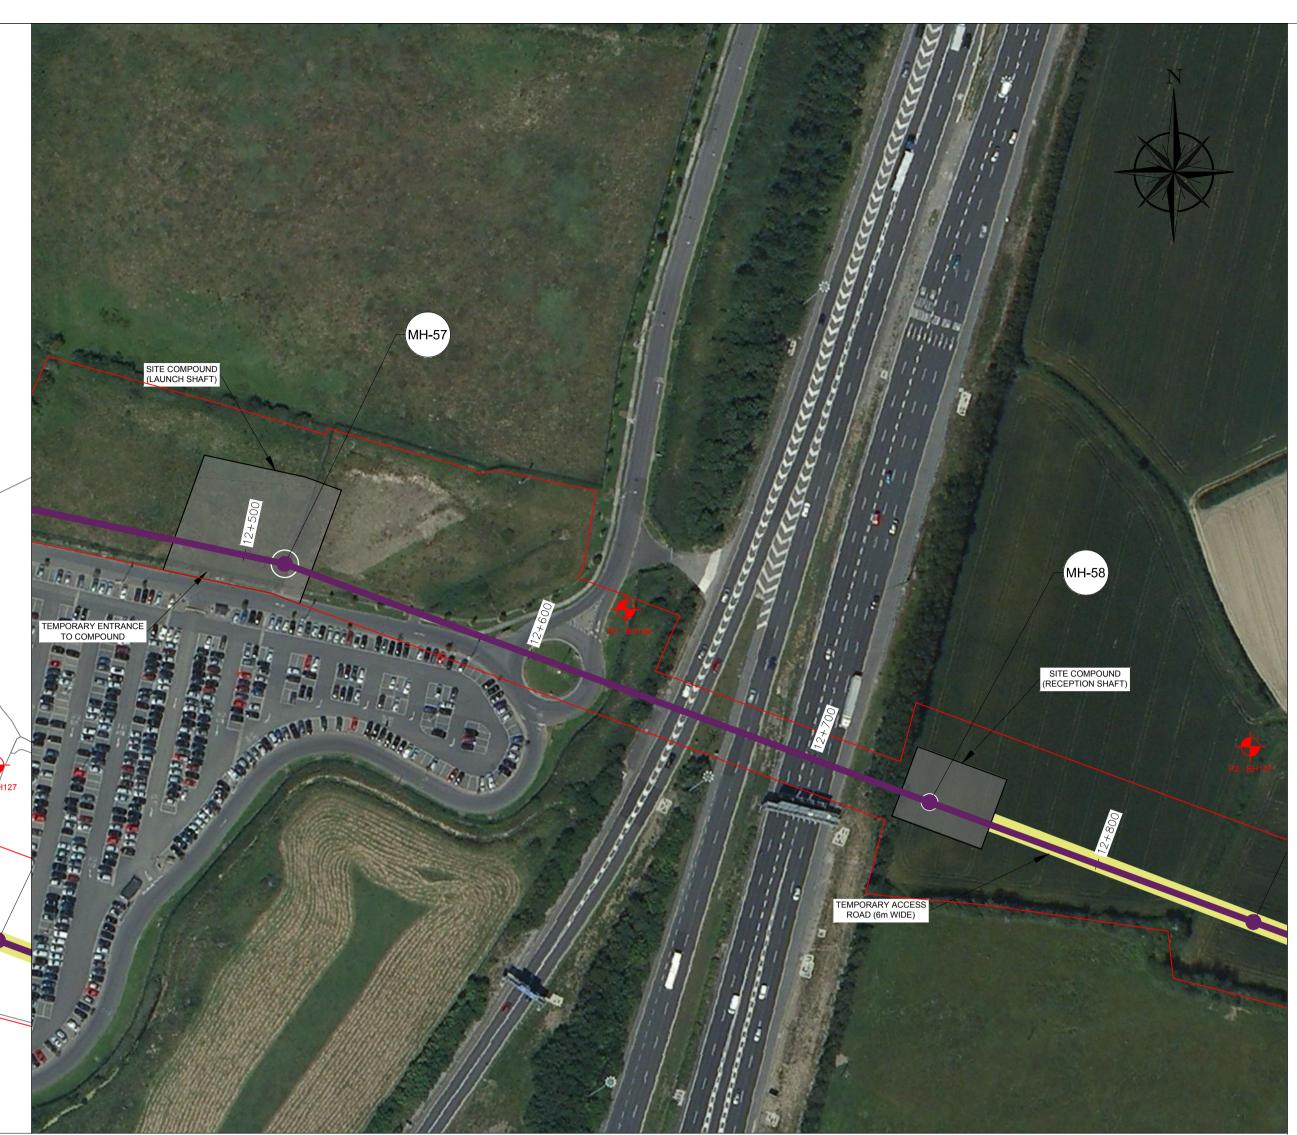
Collinstown Cross-Proposed Trenchless Crossing
